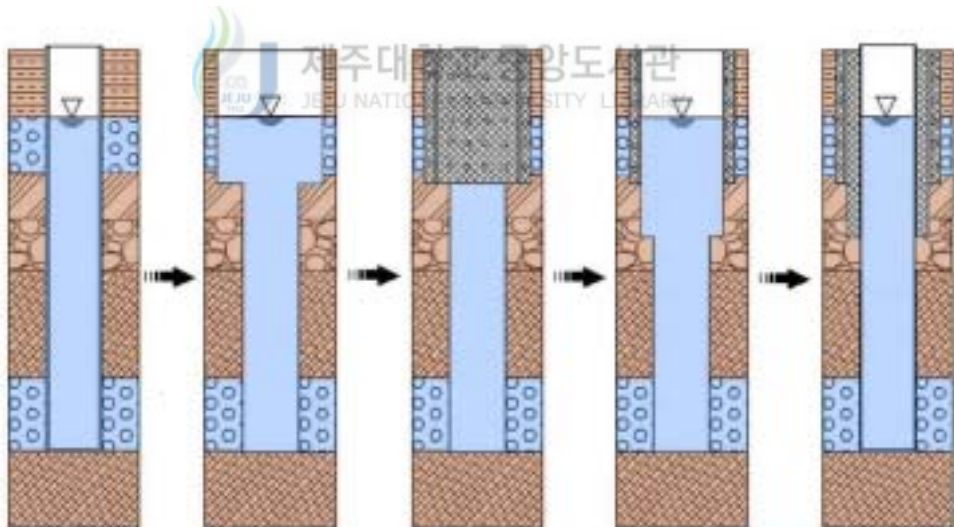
Digram of outer casing installation technique for blocking off inflow path of contamination sources (a: before repairing, b: widening a well, c: filling-grouting d: re-excavation, e: grouting of surrounding gap)
